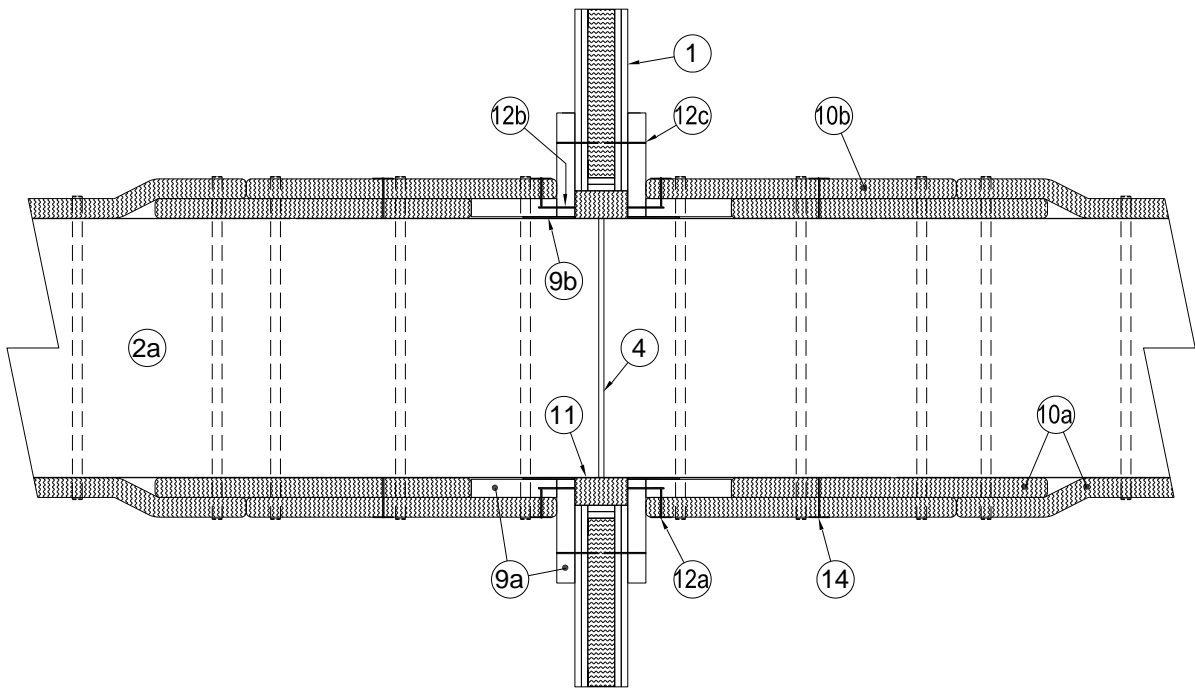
Typical Side View of Installed Horizontal Assembly
